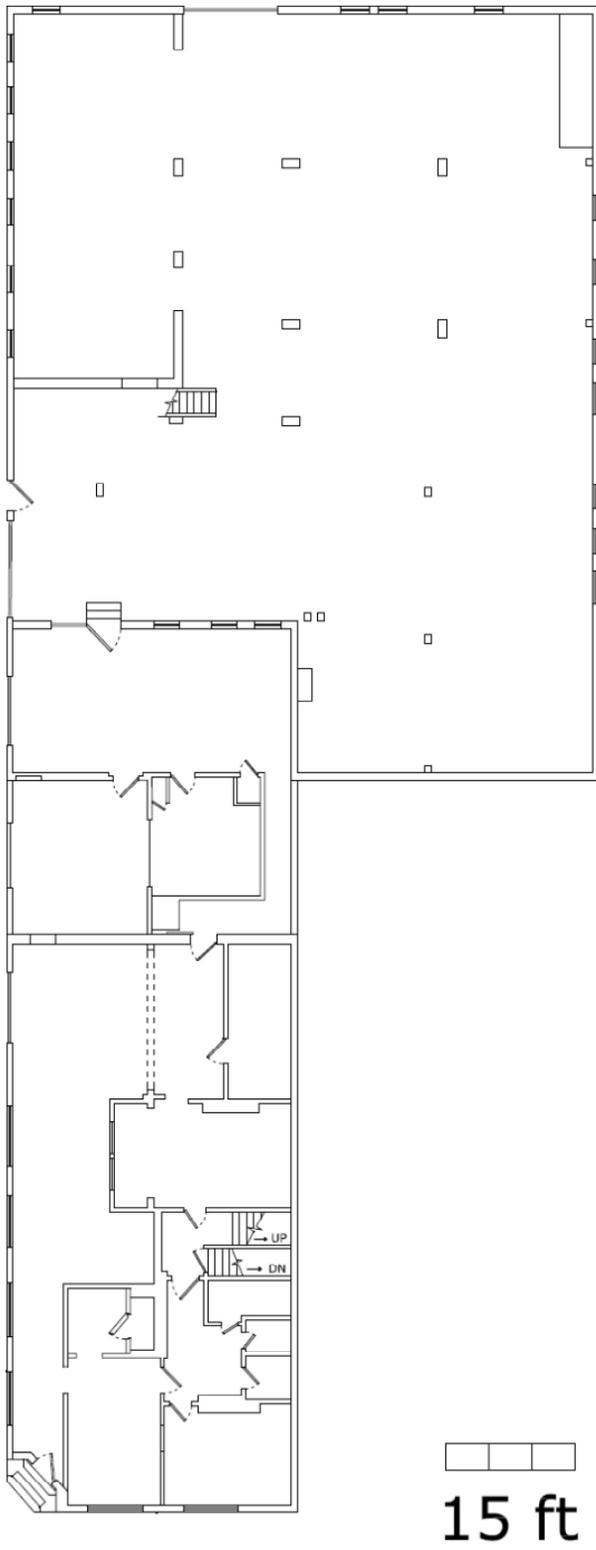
Floor plan of 321 West 12th Street, drawing by Danielle Jamieson.
